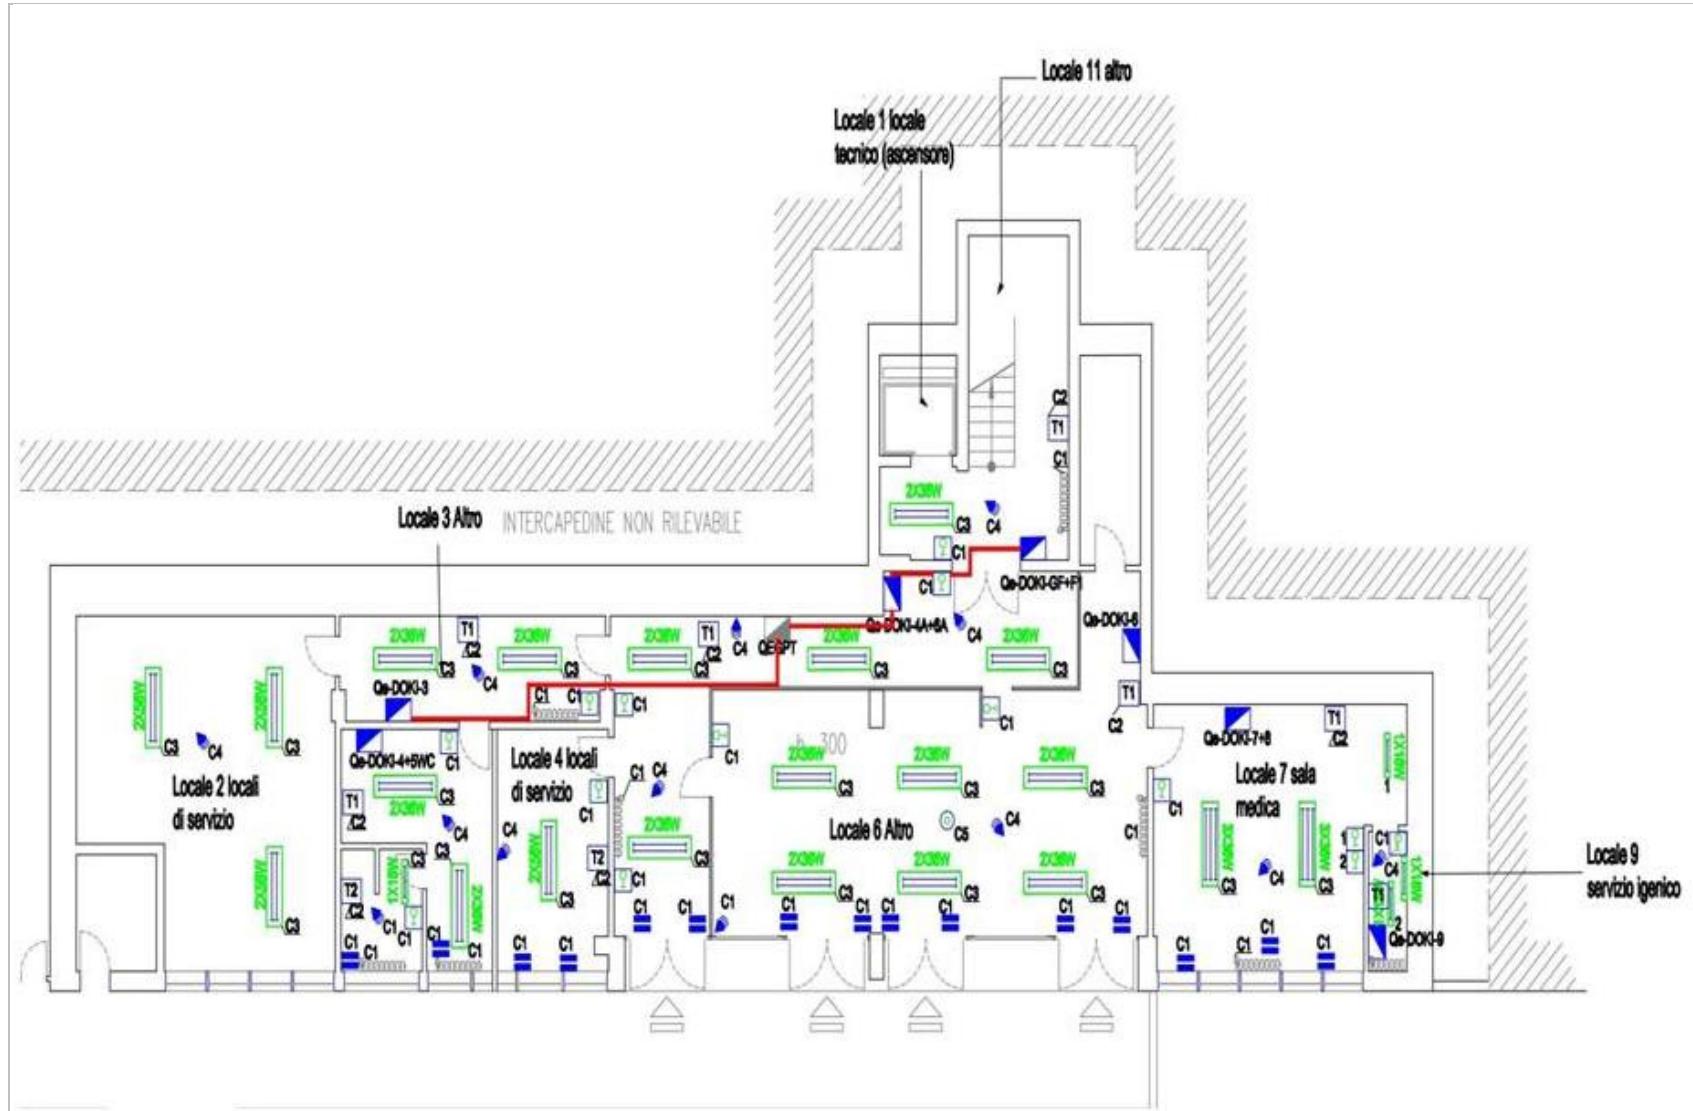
Genoa School: Ground floor Rooms and existing provisions
